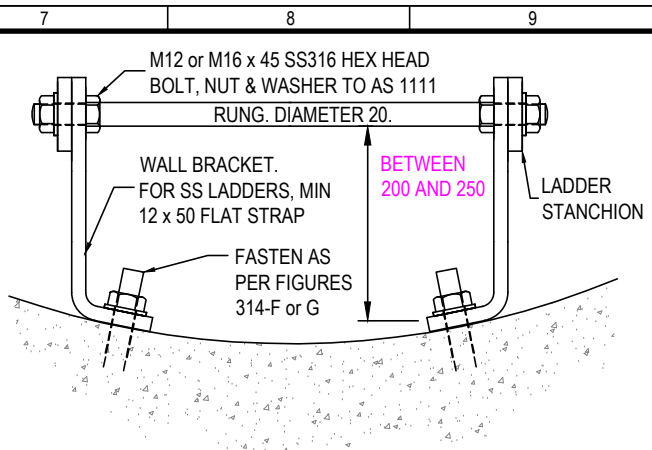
D (PLAN VIEW). CONCRETE WALL BRACKET
